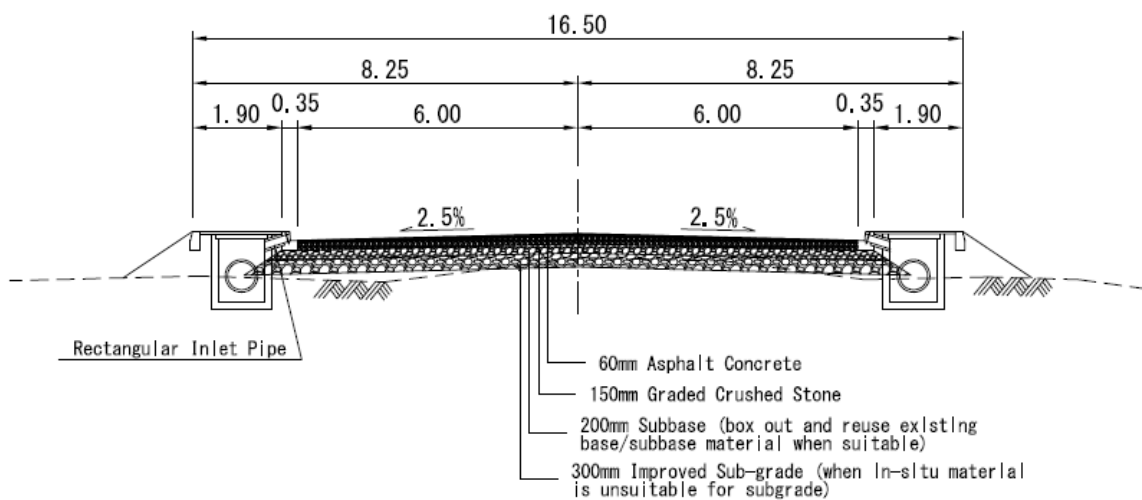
Typical Cross Section (Planned) Road F-1b/1c, Road Q (Bridge No.4 and No.7)
